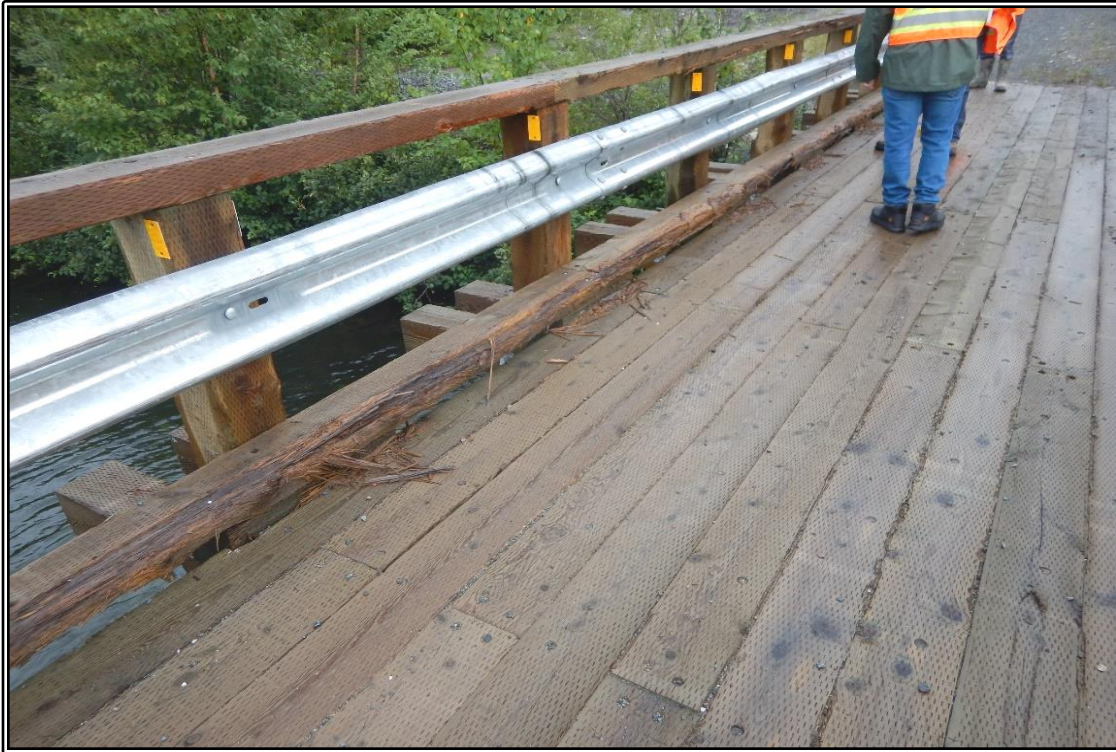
Dam 1E – TSF operational spillway access bridge in good condition.
